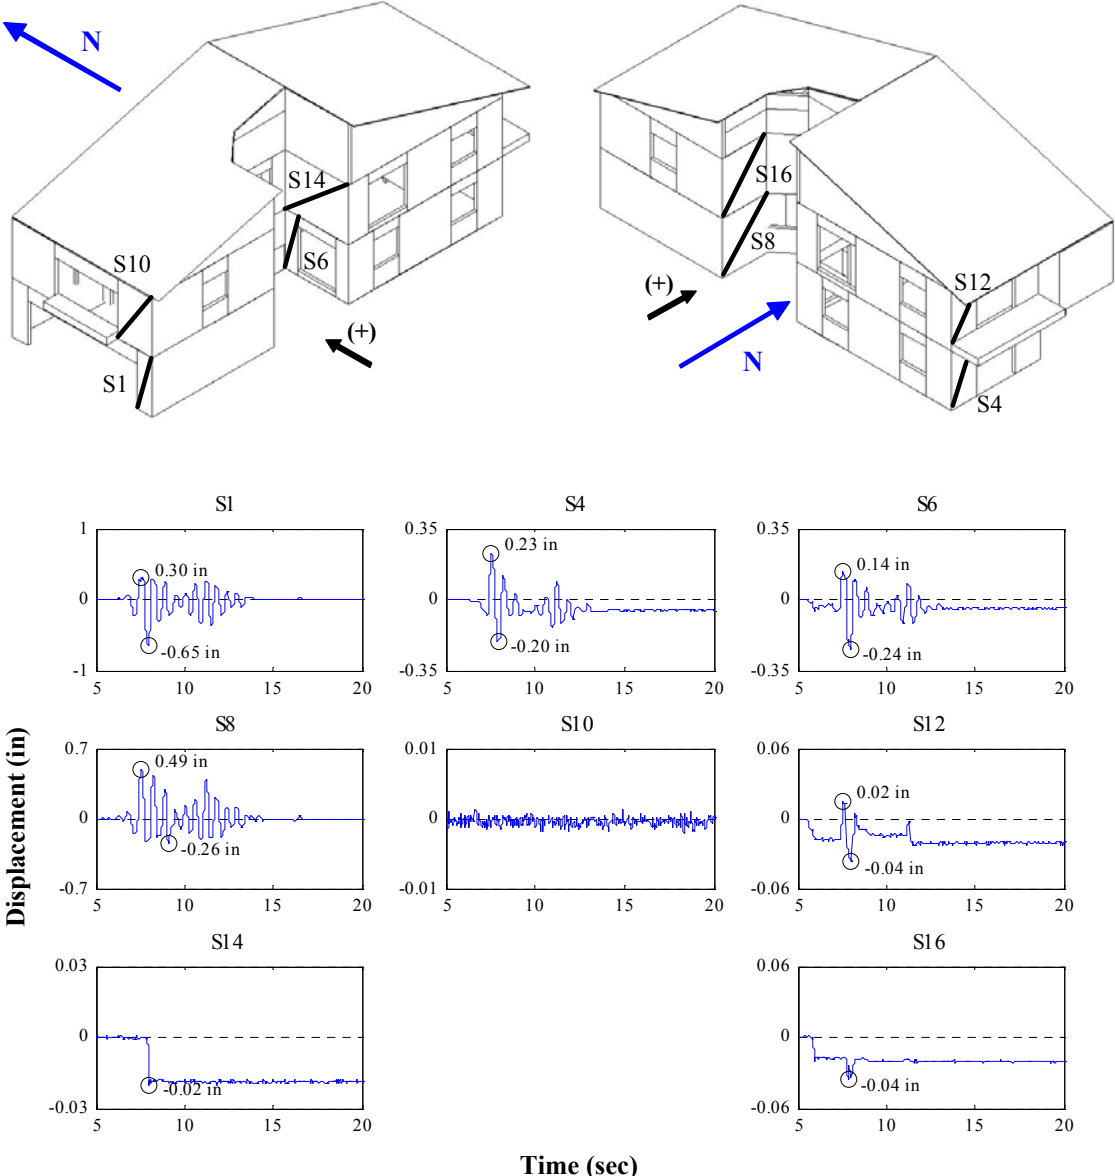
Wall deformations of north-south external walls for Test NWP5S09
